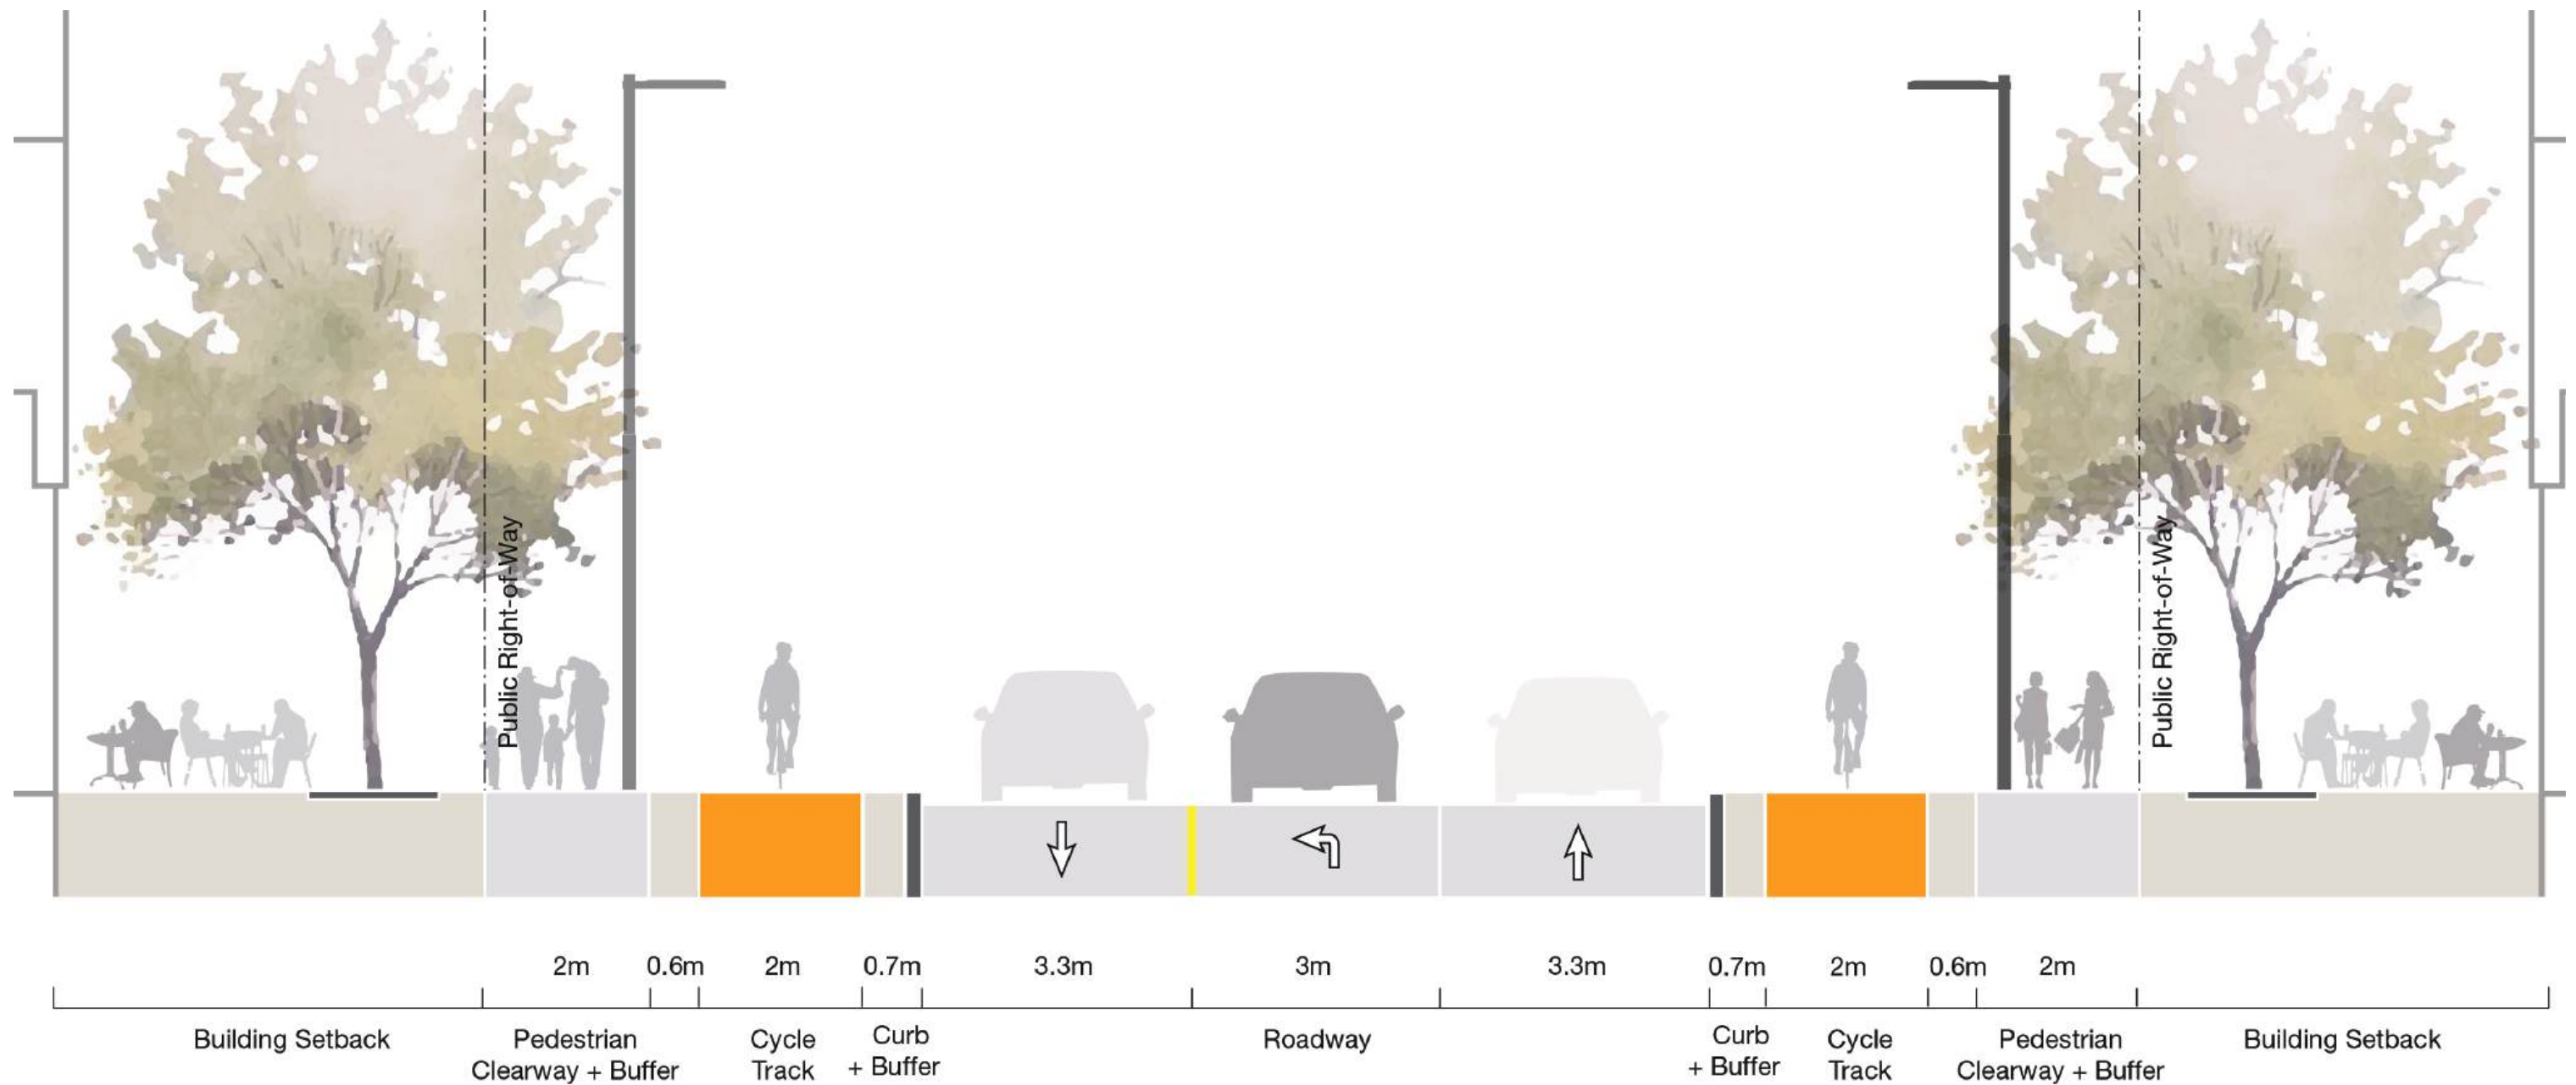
Typical Potential Public Street Section - Public Street A (Provided by DTAH)
